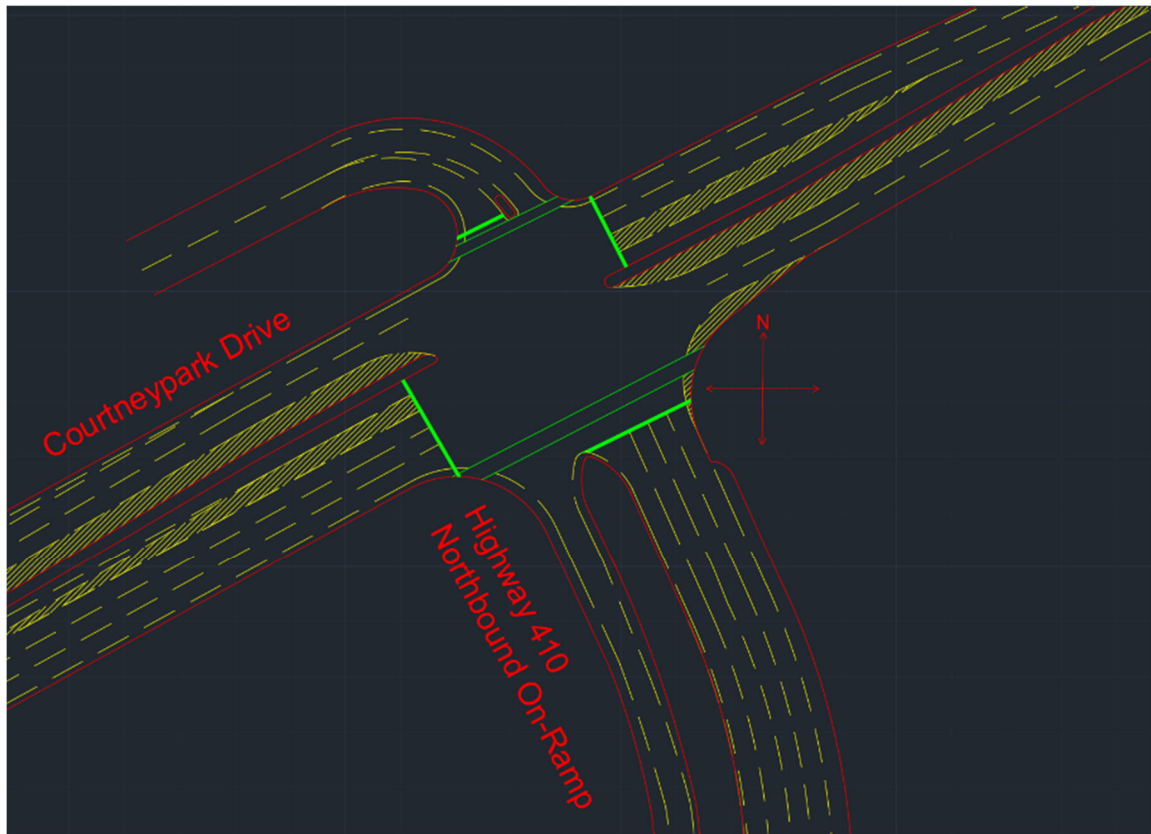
AutoCAD Drawing of Courtney Park Dr - Hwy 410 On-Ramp
